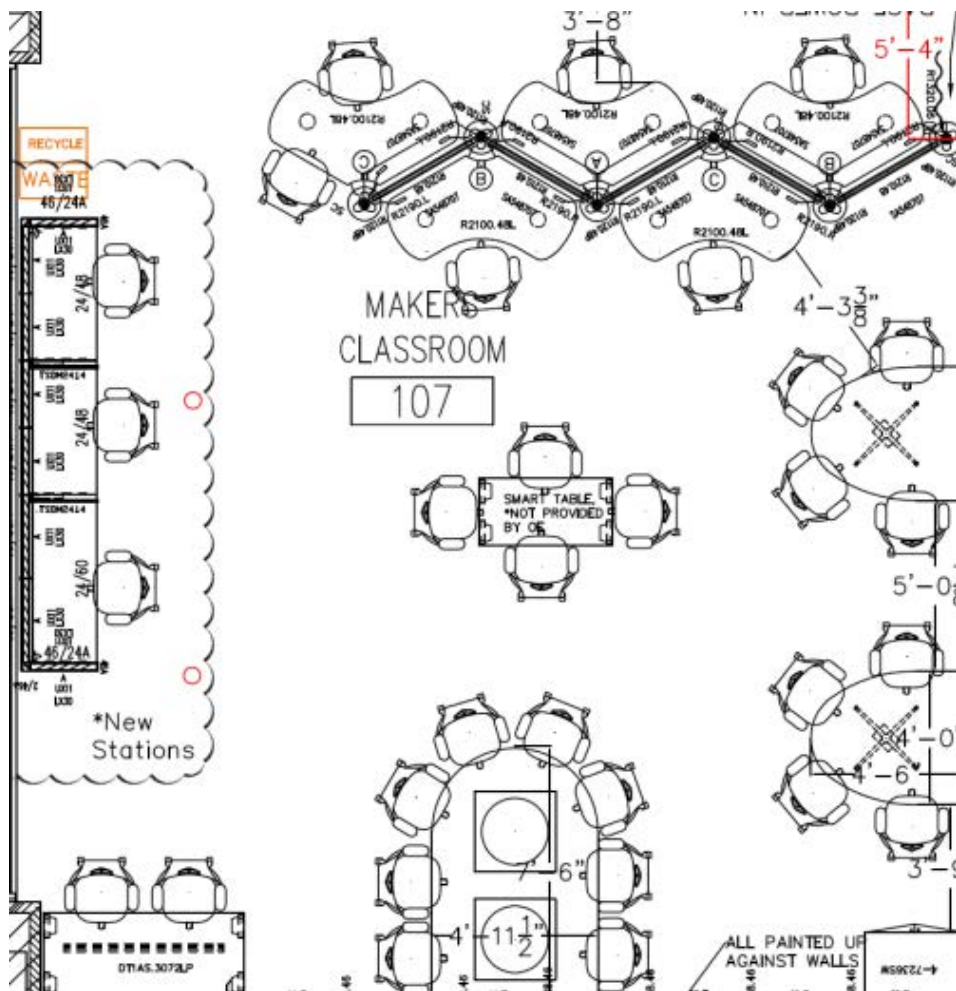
2014 Made@UF floor plan with potential 2018 changes.
